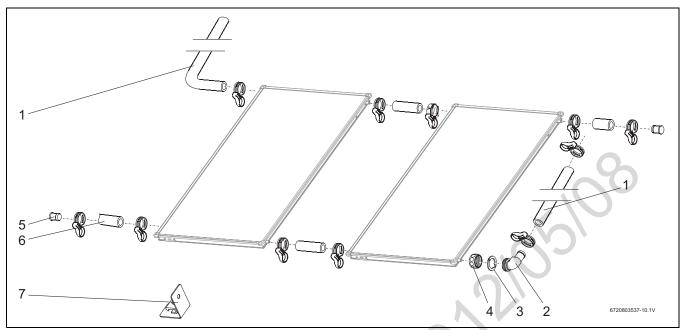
Connection set and joining set (shown with 2 vertical collectors)
